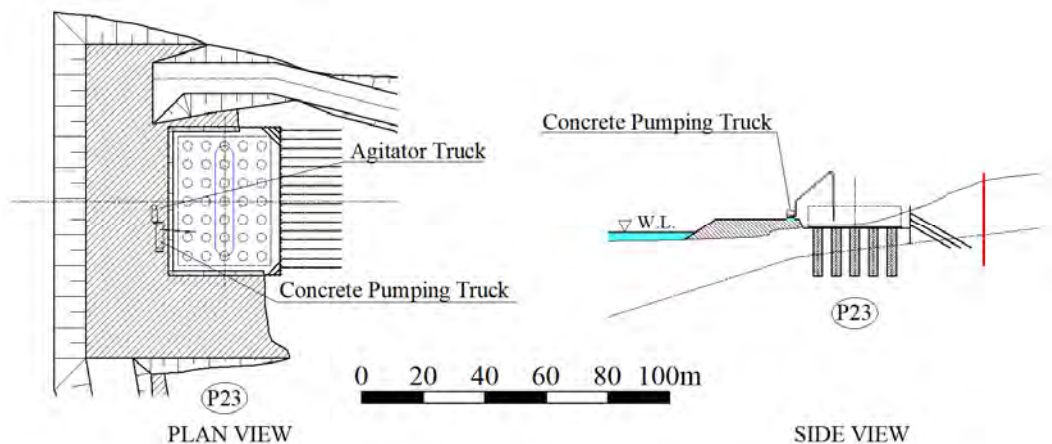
Reference Drawing for Construction of Footing (Placing Concrete)
